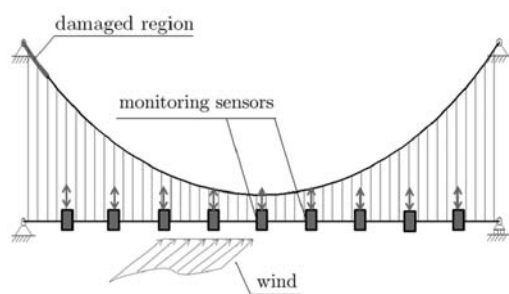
Sketch of the structural health monitoring configuration with highlighted damaged region.
